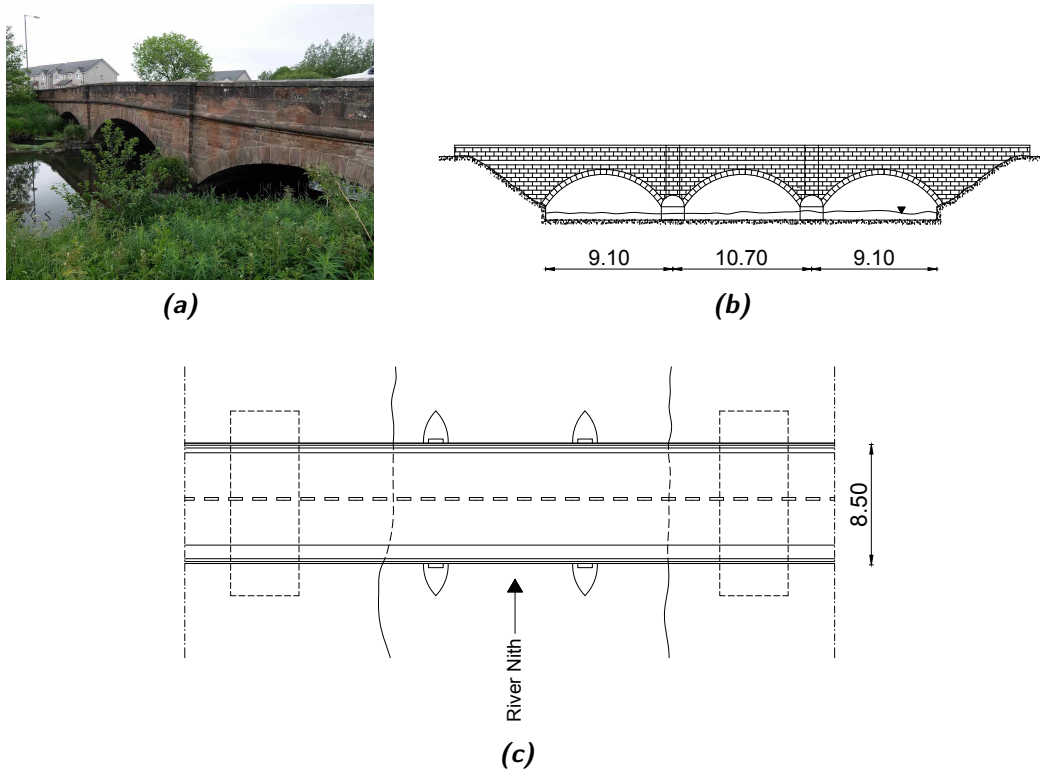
(a) A76 200 Nith bridge, (b) bridge elevation and (c) and plan view
